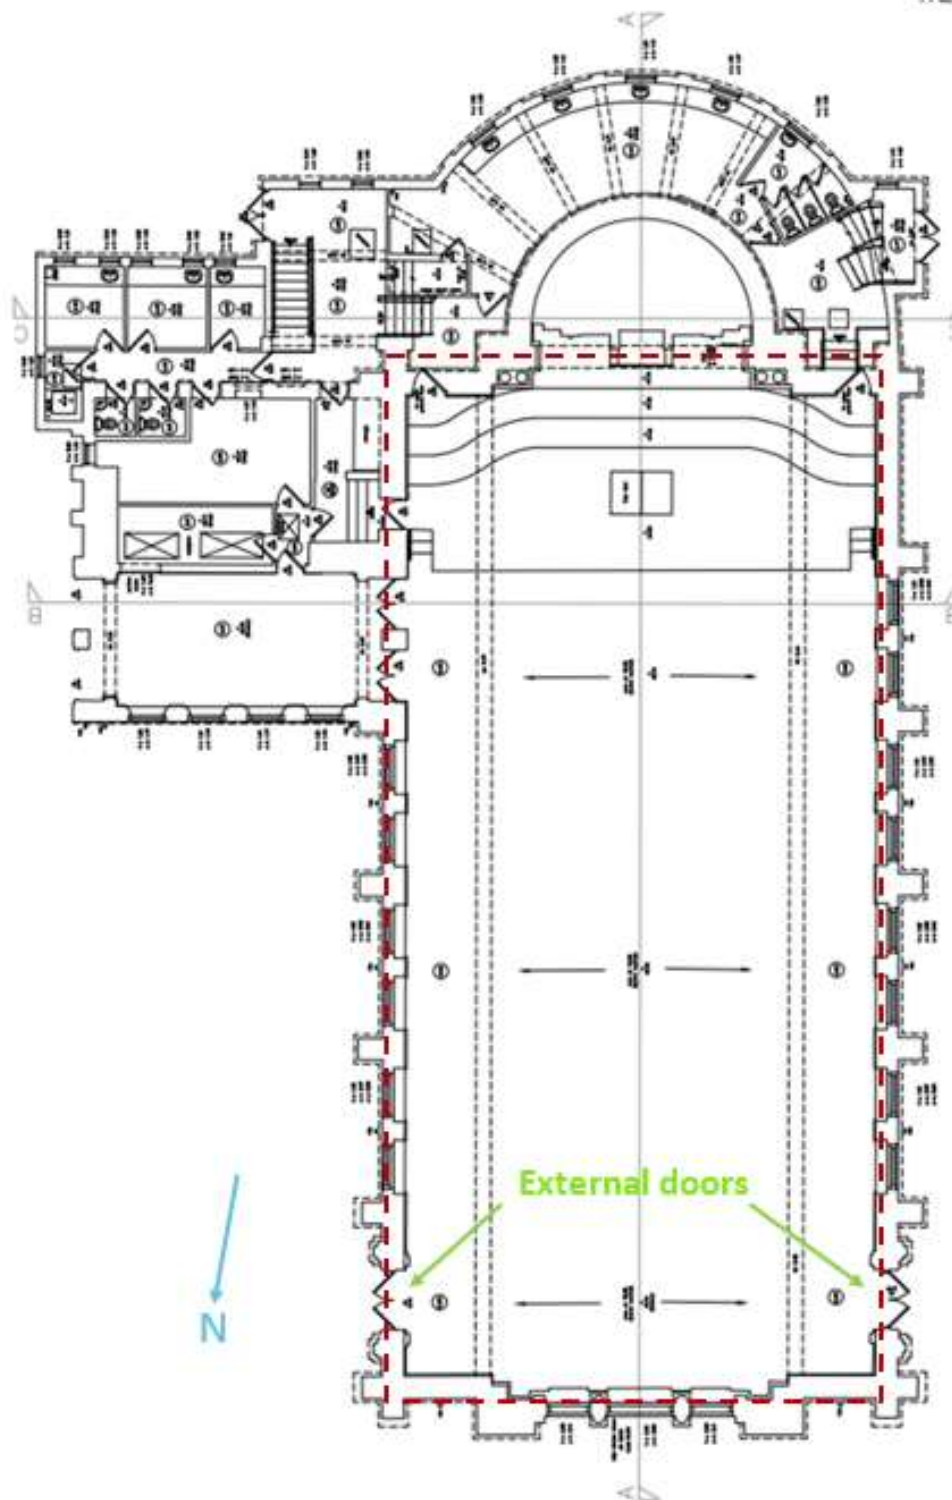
Layout of the ground floor of the Great Hall showing the main hall outlined in red and the location of external doors used for additional ventilation and access.
